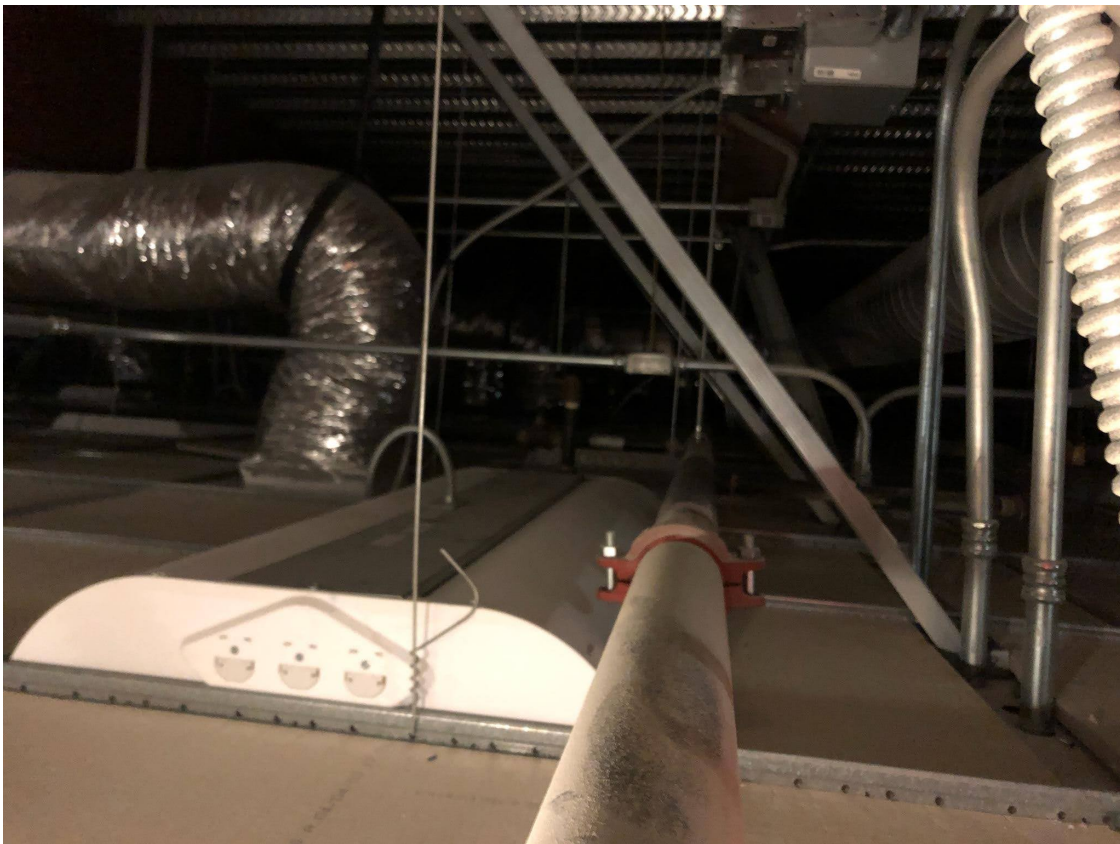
Red Victaulic Coupling in a Sprinkler Pipe Run in the New Commercial Building
